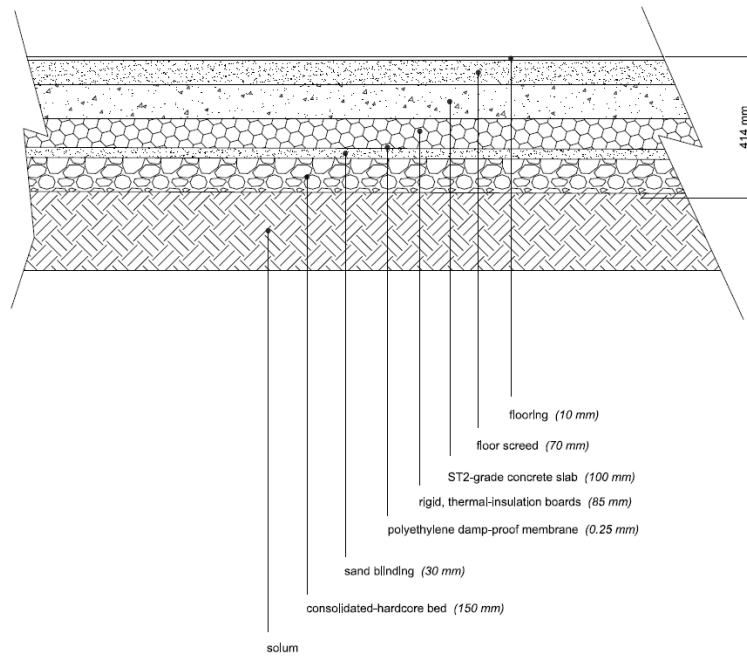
Ground floor D1 (ground-supported concrete floor), cross-section.
